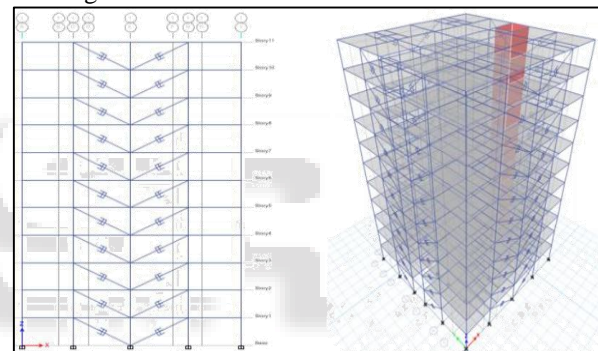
Elevation and 3D view of Fluid viscous damper model
